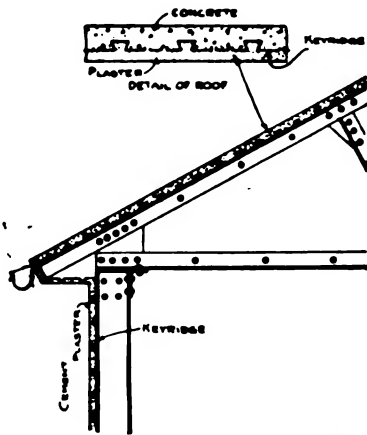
ROOF SLAB ON PITCHED ROOF REINFORCED WITH KEYRIDGE METAL
